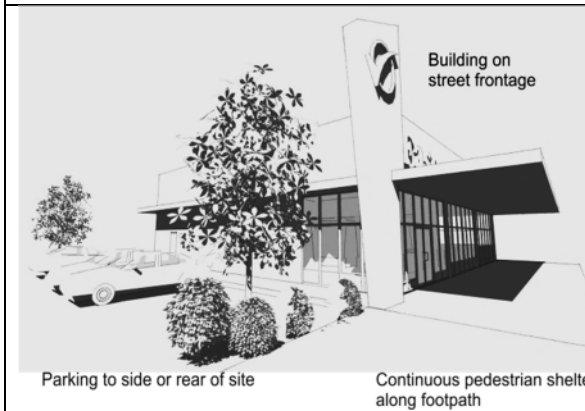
3—Preferred parking location on designated commercial frontage
